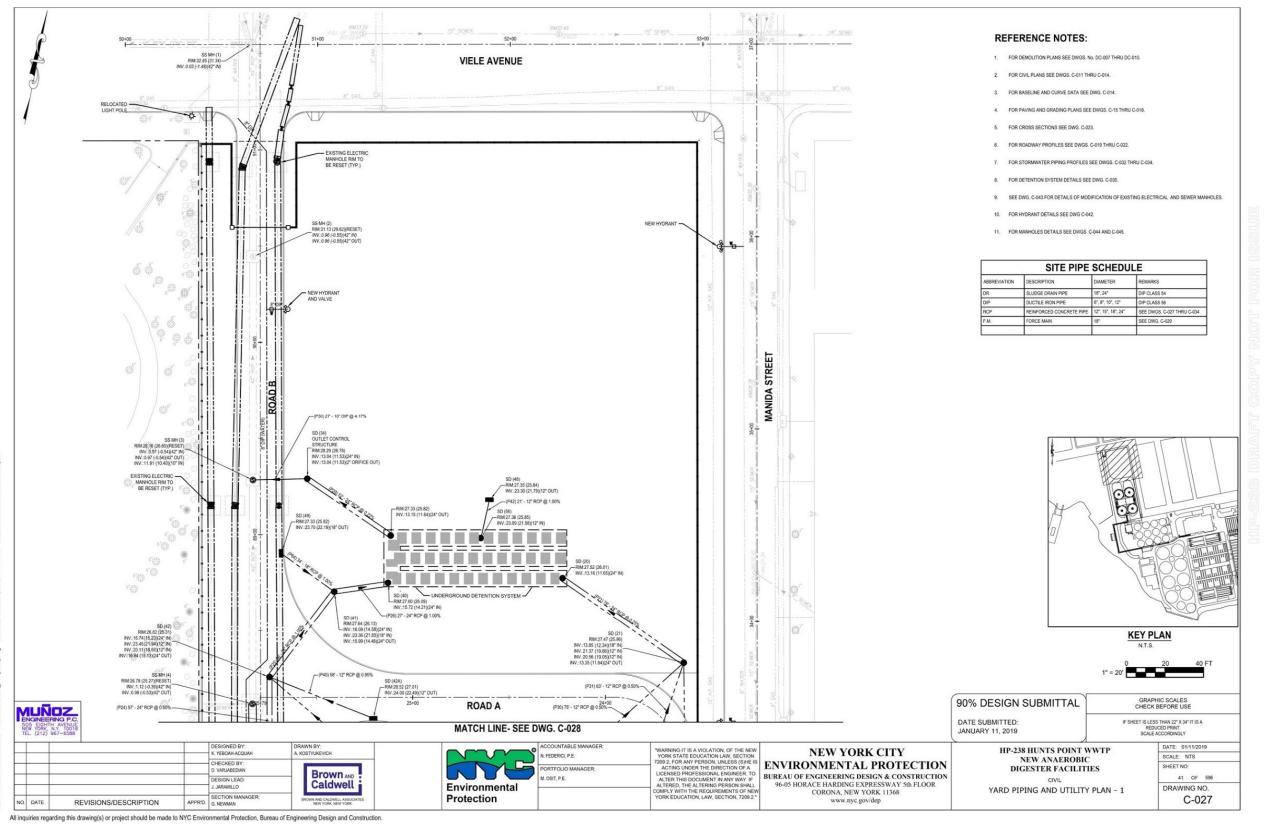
Project Plans for the northern end of the APE showing location of Underwater Detention System (refer to Appendix A for additional site plans).
